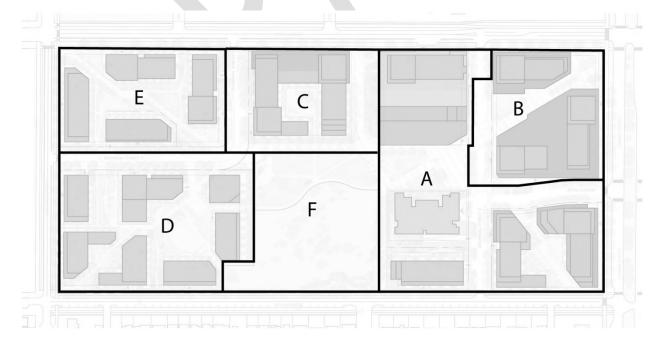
Sub-Areas for Maximum Permitted Floor Area and Permitted Uses
